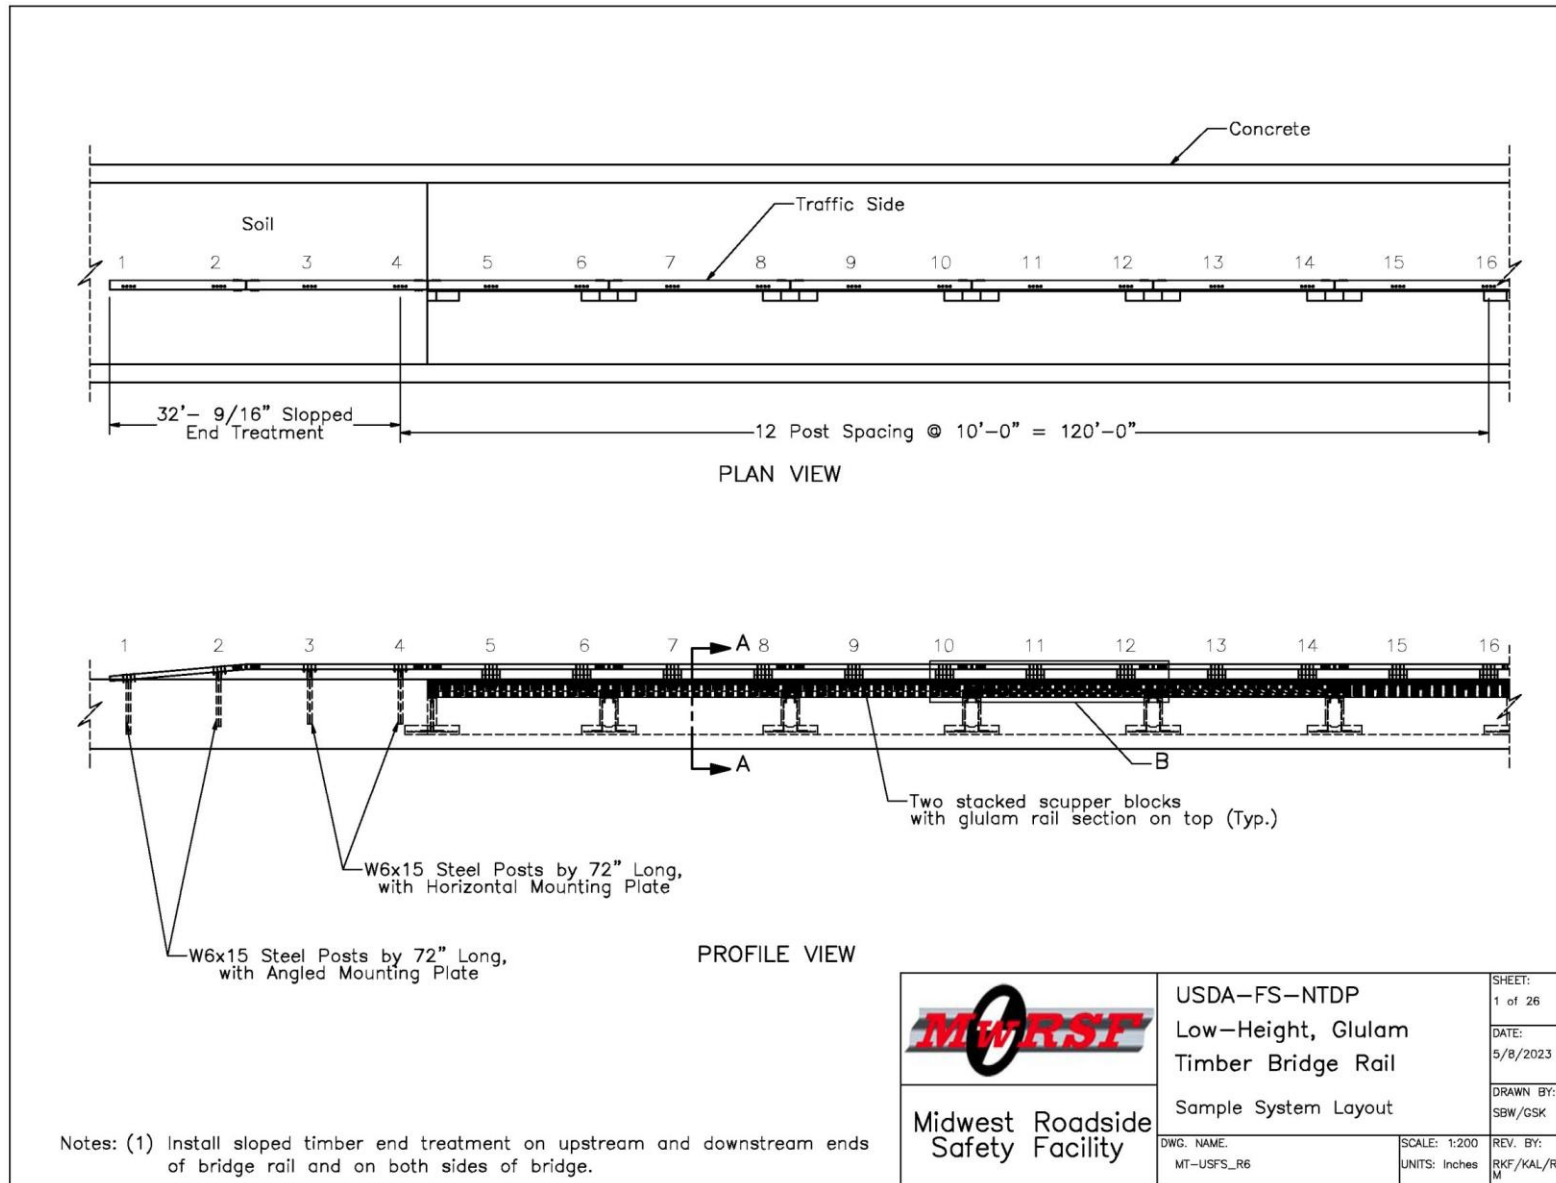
USDA-FS-NTDP Low-Height, Glulam Timber Bridge Rail: Sample System Layout
